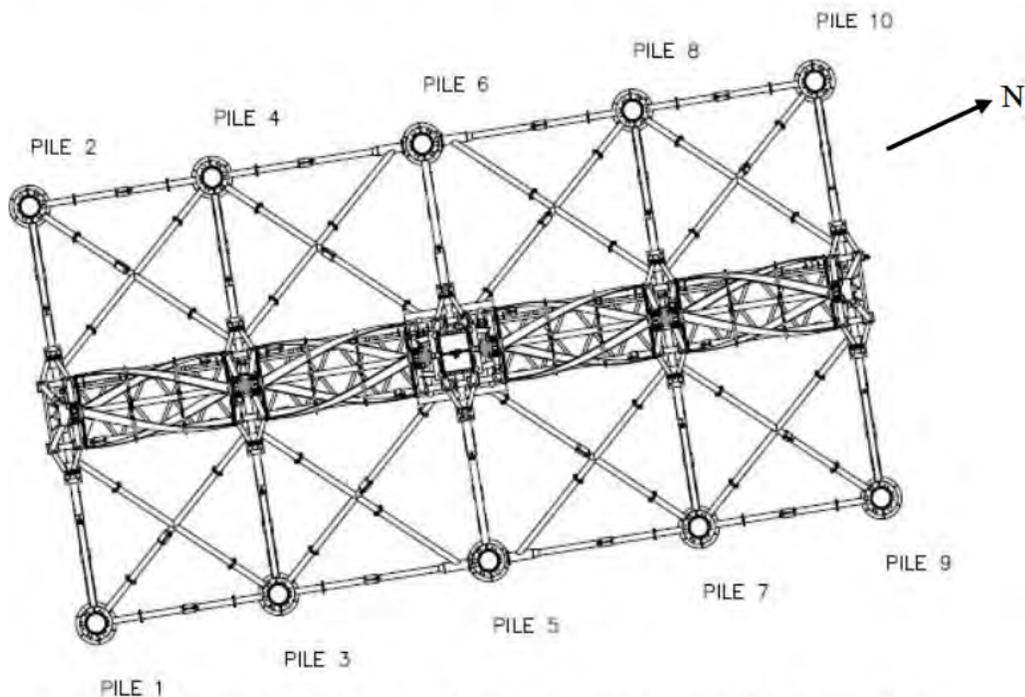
Plan view of TidGen[®] Power System showing pile numbers
